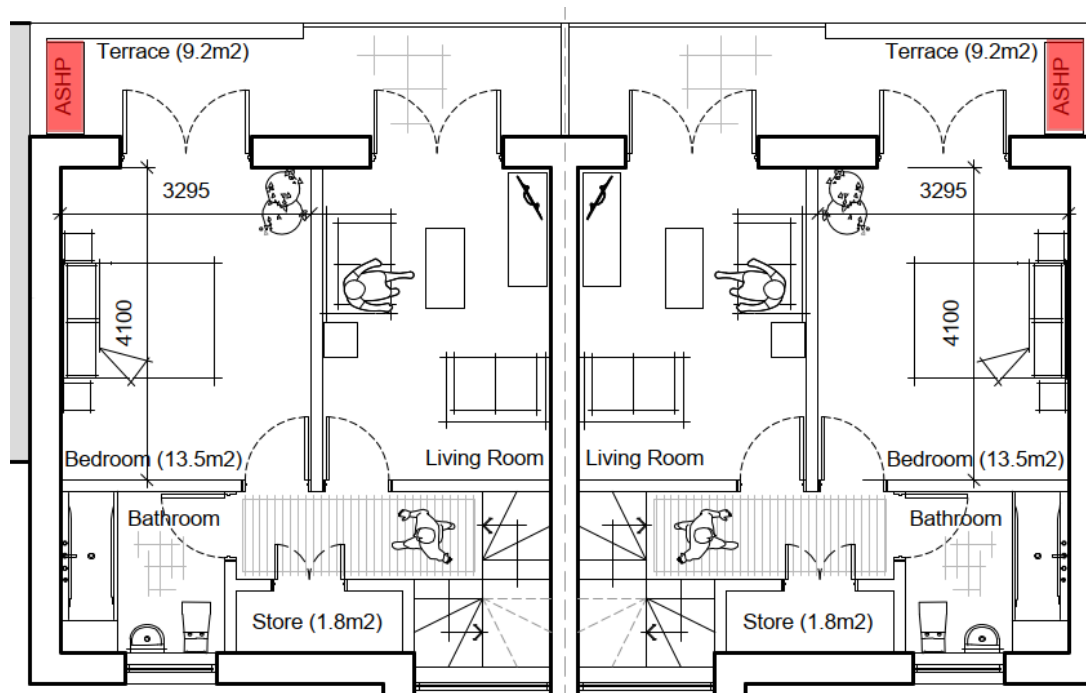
Proposed First Floor- Roof area for ASHP location
